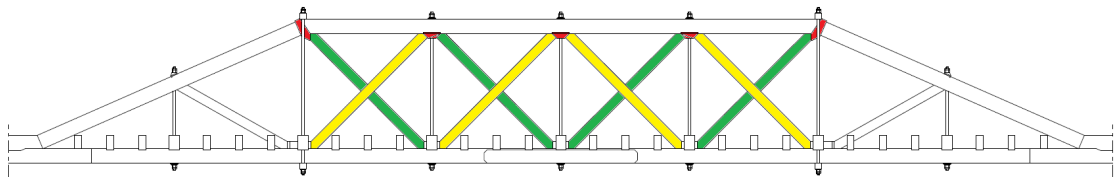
Original 90' McDonald design with laminate layout of bottom chord.
